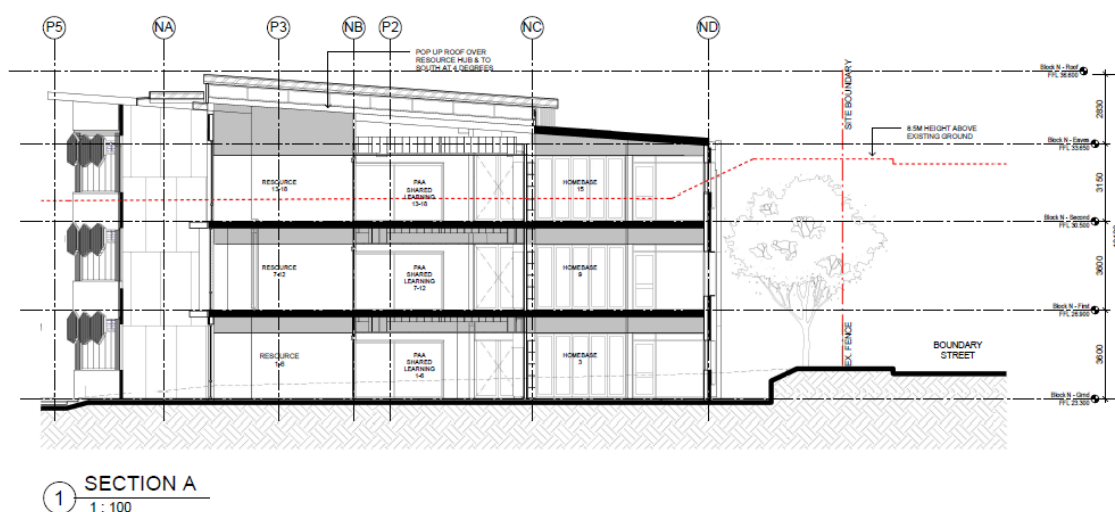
Extract of Cross Section – Building N (prepared by NBR Architecture)
